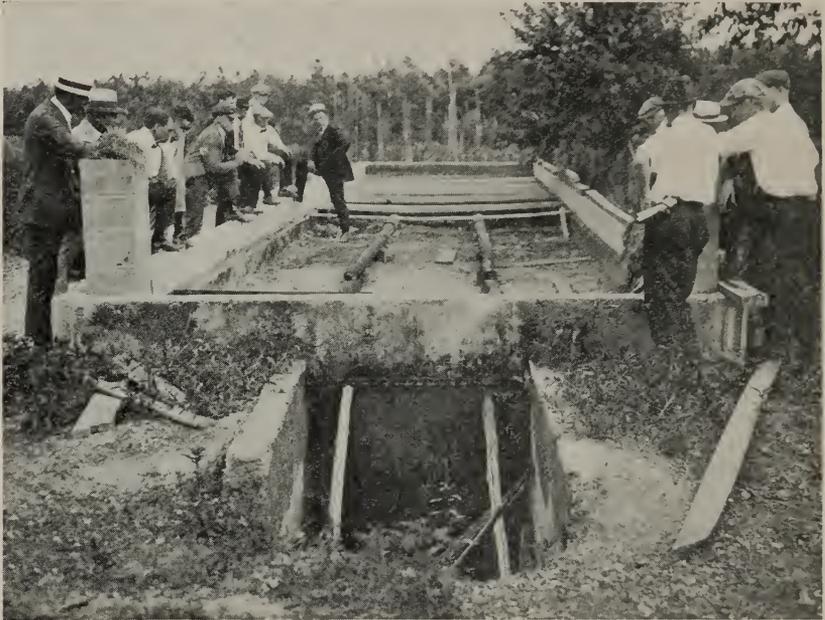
Top view of fire-heated hotbed, concrete construction. (Courtesy New Jersey Experiment Station.)
